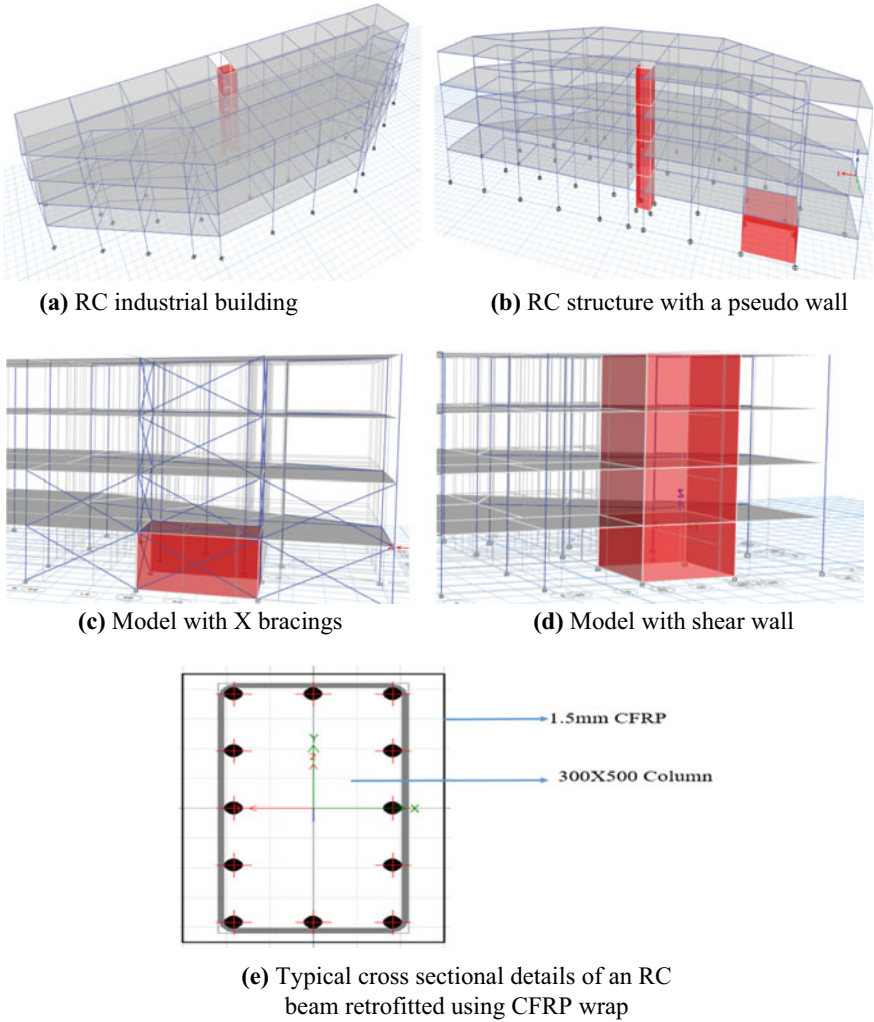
Structural models and details adopted in the present study, a RC industrial building, b RC structure with a pseudo-wall, c model with X-bracings, d model with shear wall, e typical cross-sectional details of an RC beam retrofitted using CFRP wrap
